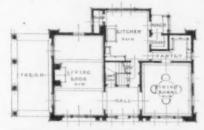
Central hall plan enlarged by small extension at rear. Floor area 1,152 square feet, exclusive of porches
